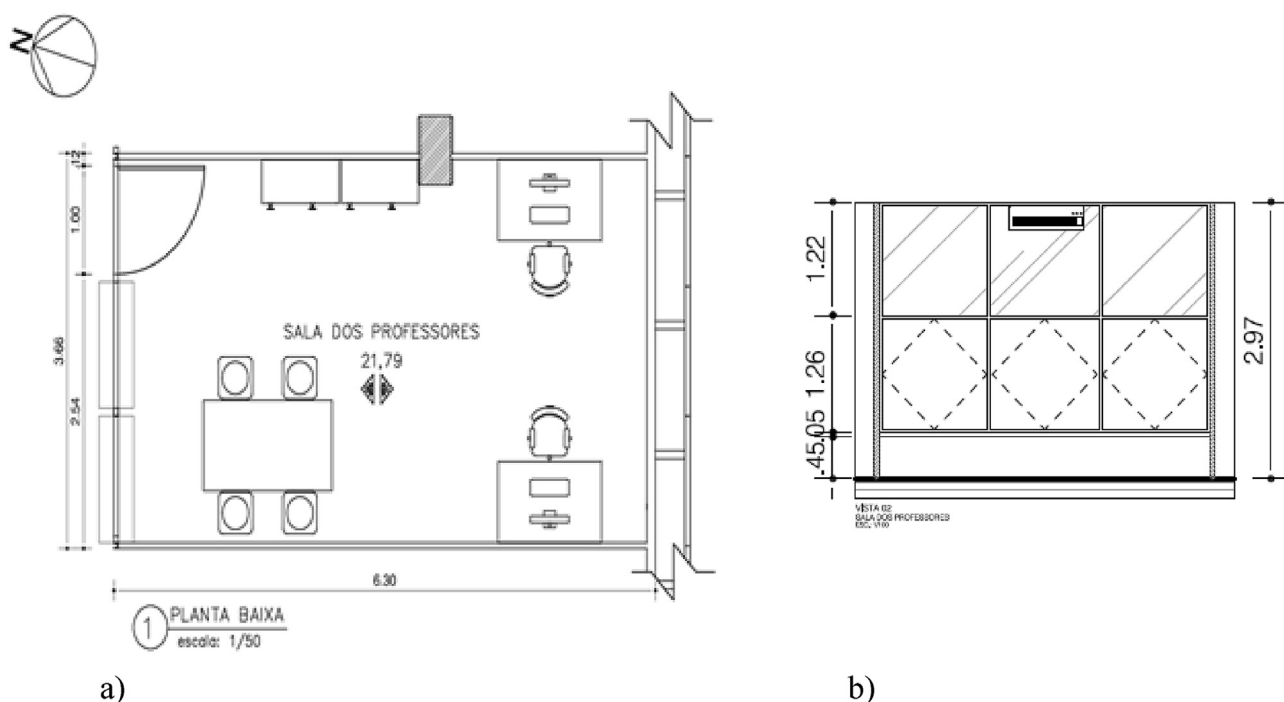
(a) Floor Plan of classroom D, and (b) Frontal view of the window.
